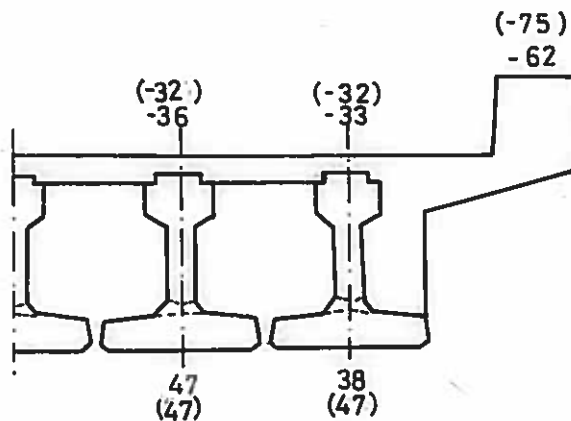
contd. Granville Road Bridge (Tee Beam)
